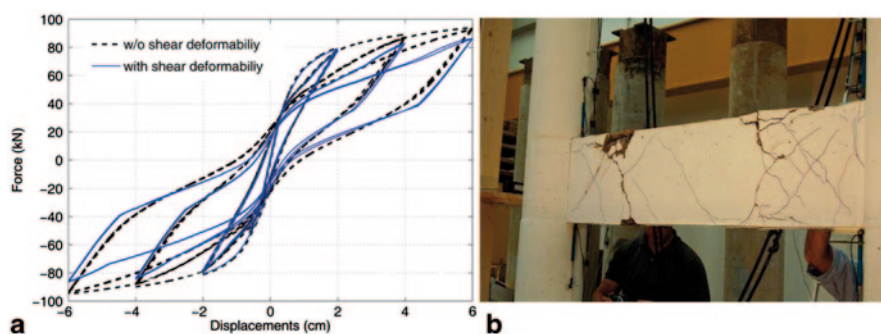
Pier #12: a Force-deflection cycle, b Shear damage in the transverse beam
